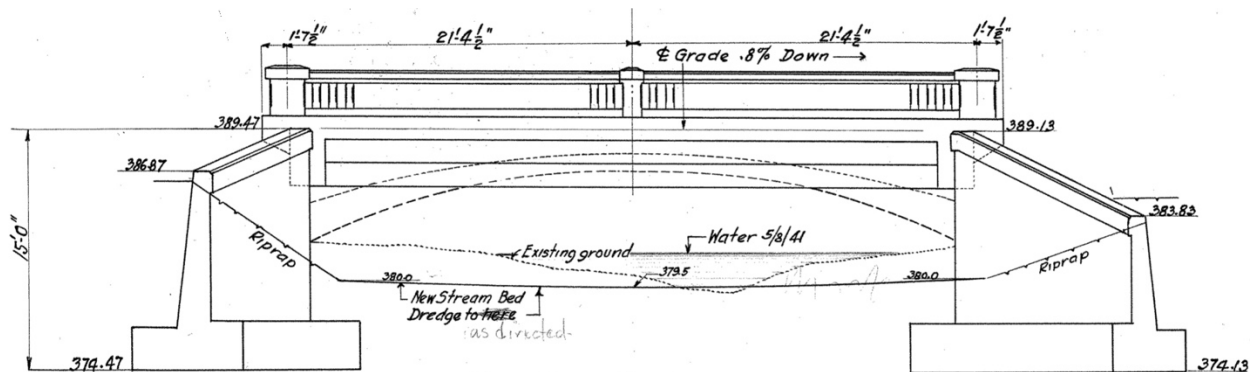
Elevation from the 1944 plans. Source: Connecticut State Highway Department Plan for Construction of Widening to Existing Bridges on Routes No. 188 & 63 in the Town of Middlebury....” 7.
